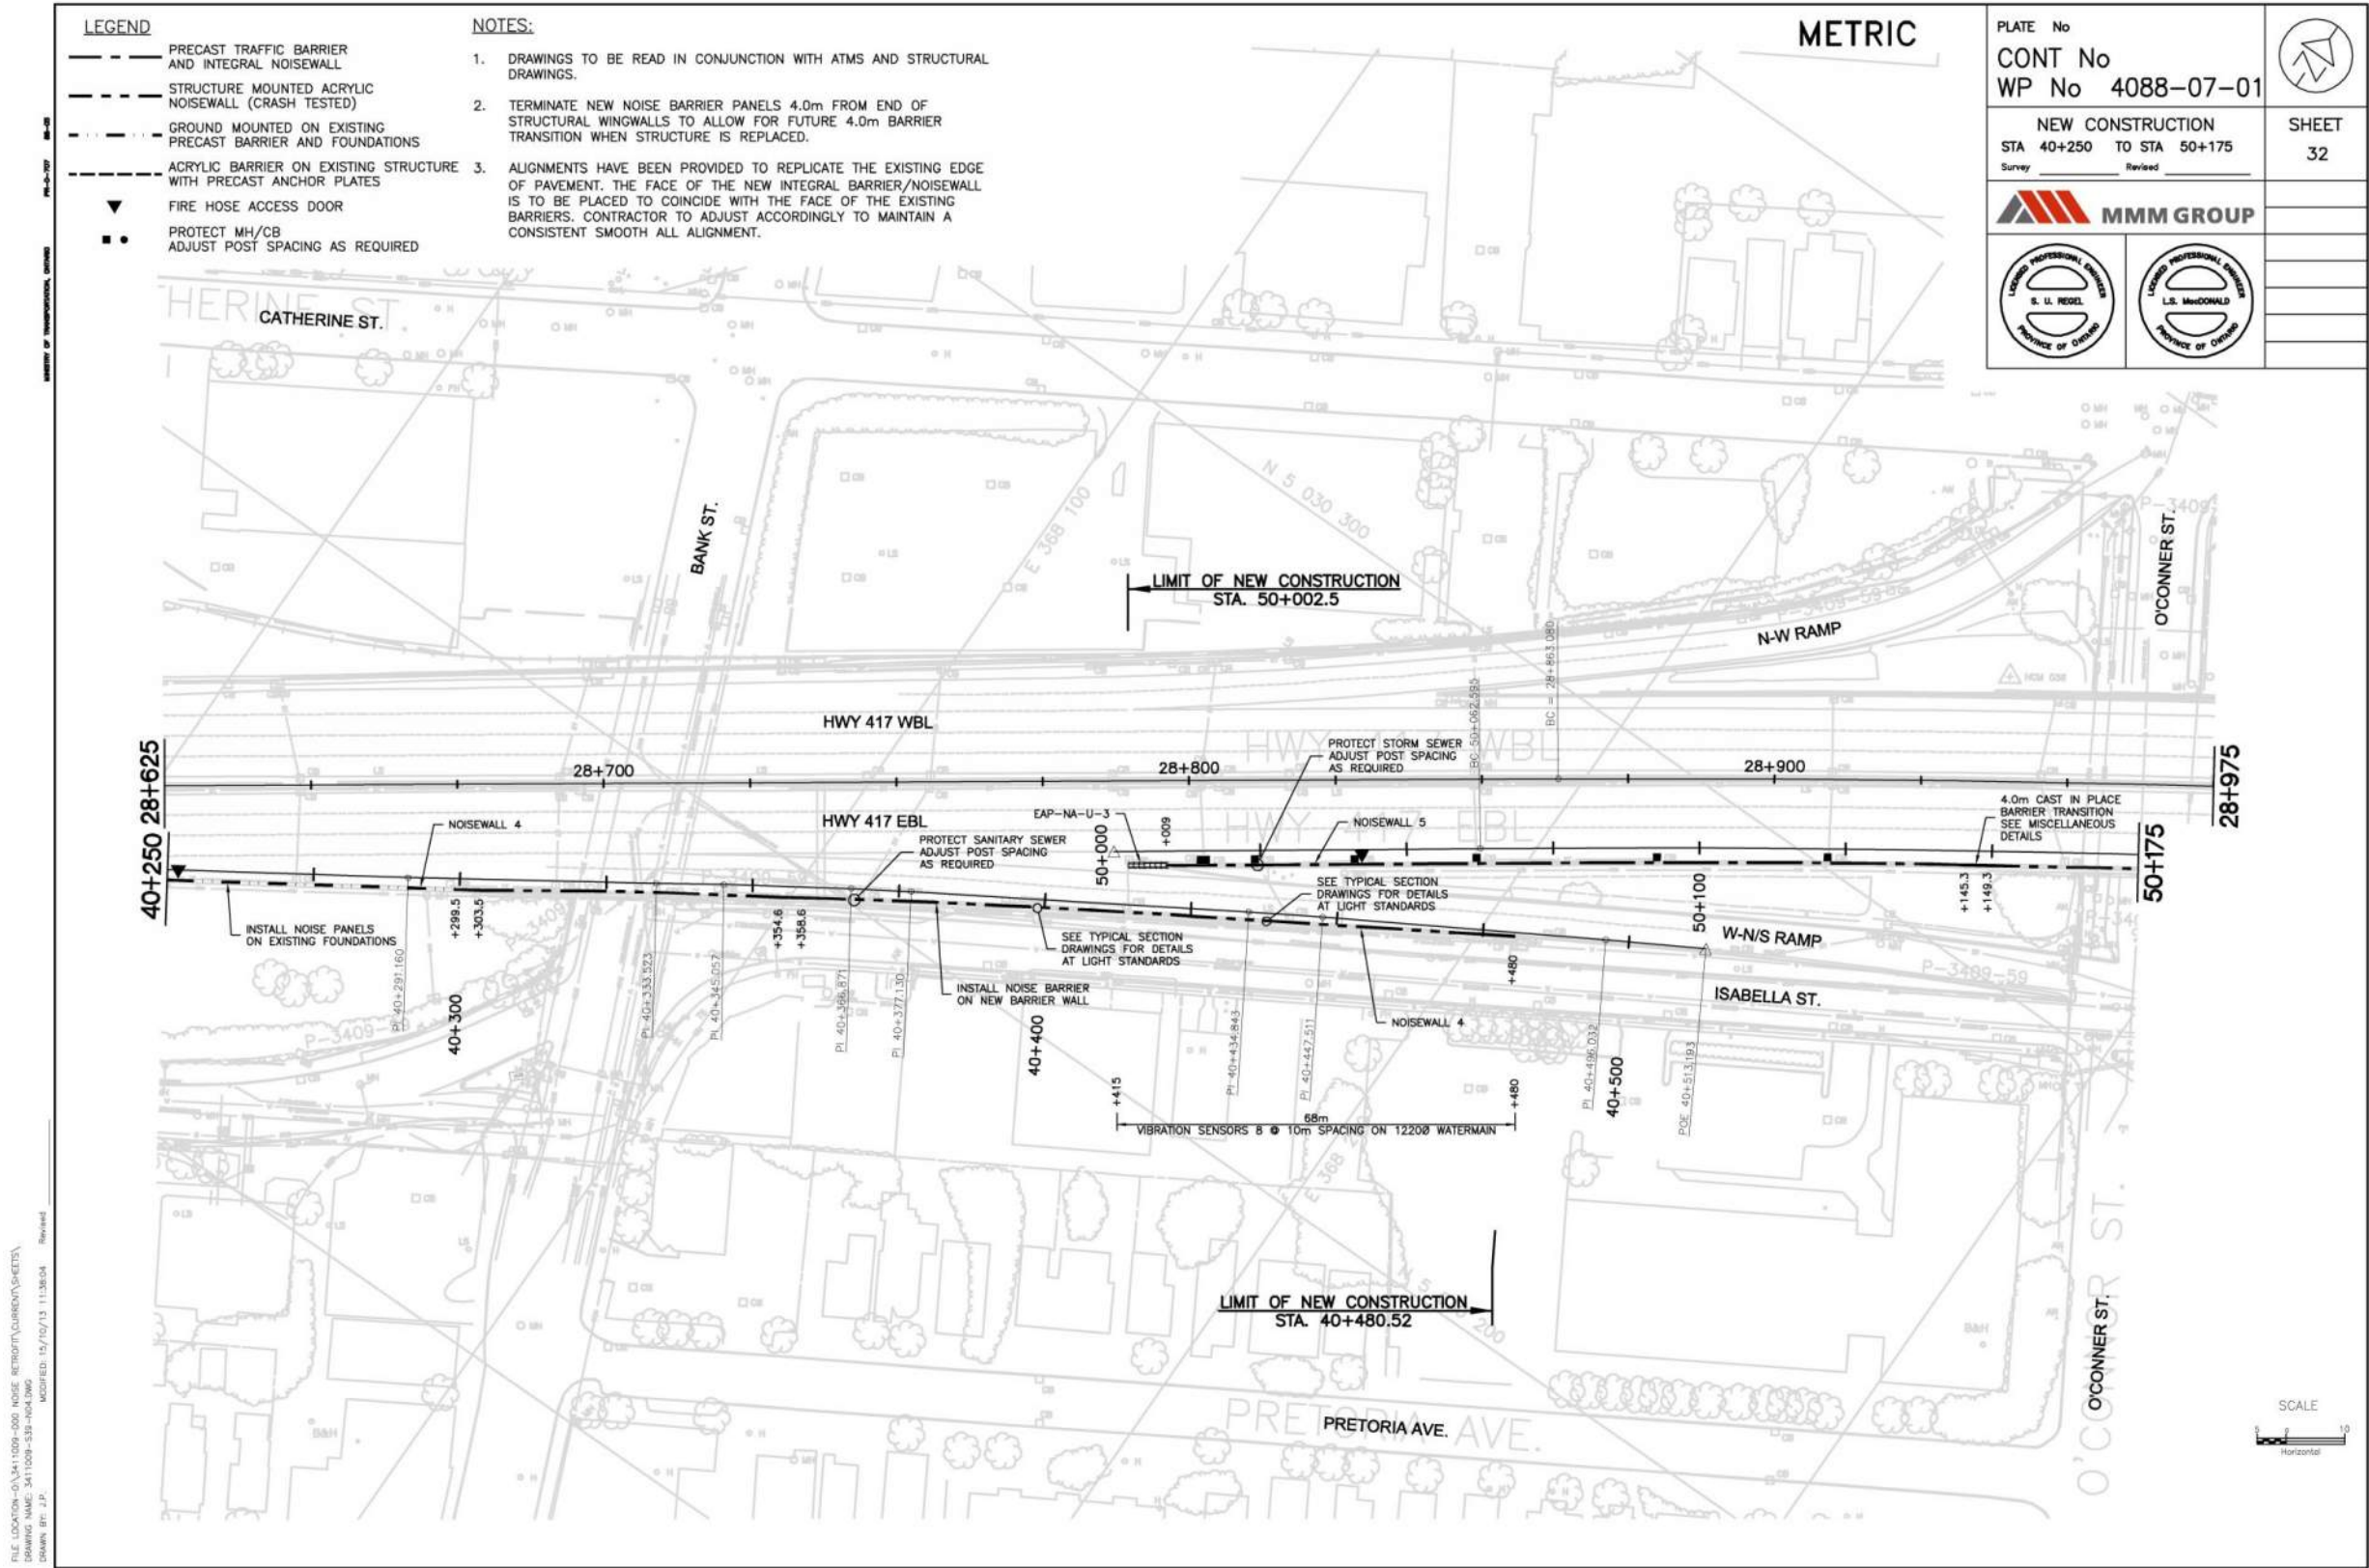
Highway 417 Noise Barrier Retrofits Recommended Plan – Noise Walls 4 and 5
